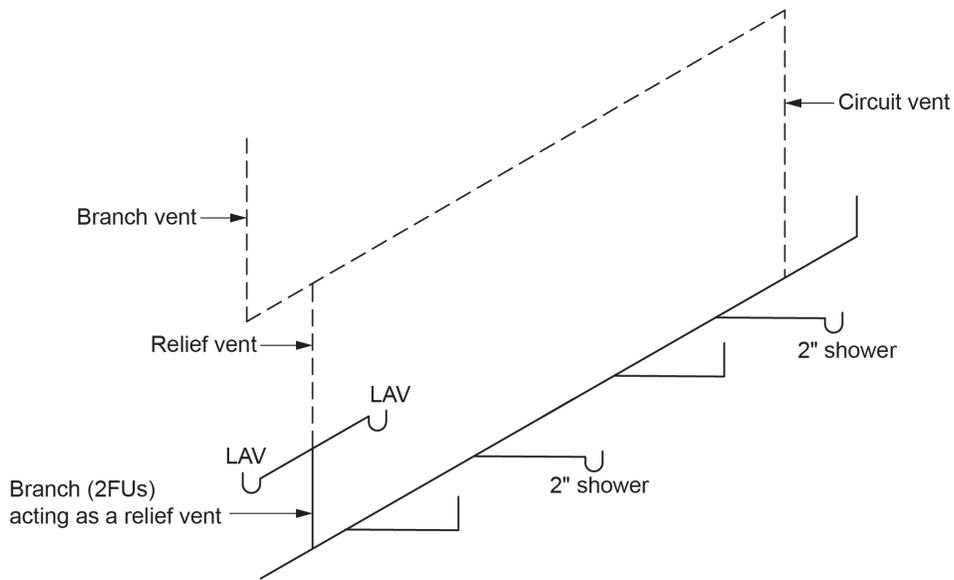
The 1.5 in. traps are being separately circuit-vented when connecting to a circuit-vented branch. (Skilled Trades BC, 2021) Used with permission.
